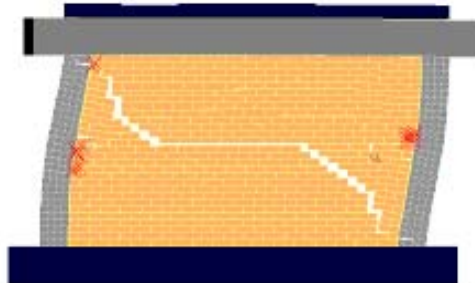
Typical failure pattern of weak infill- strong frame specimens
